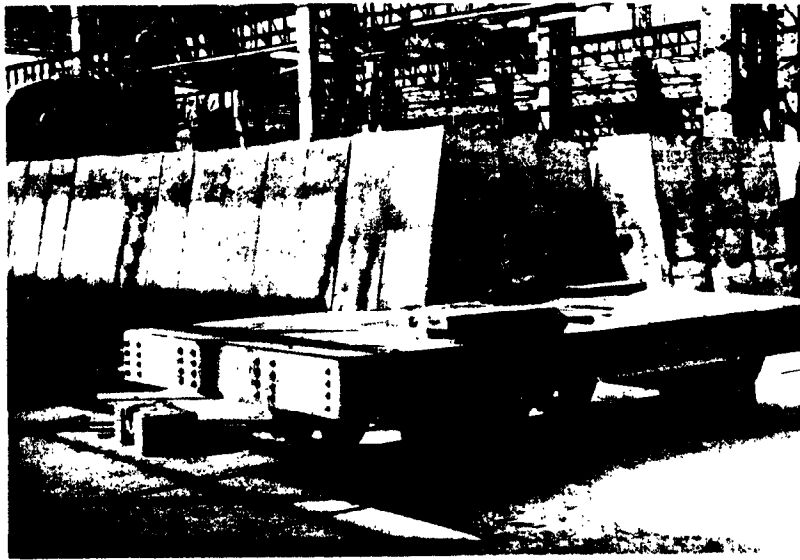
Precast, reinforced-concrete blast walls (0.85 mile from ground zero at Nagasaki).
